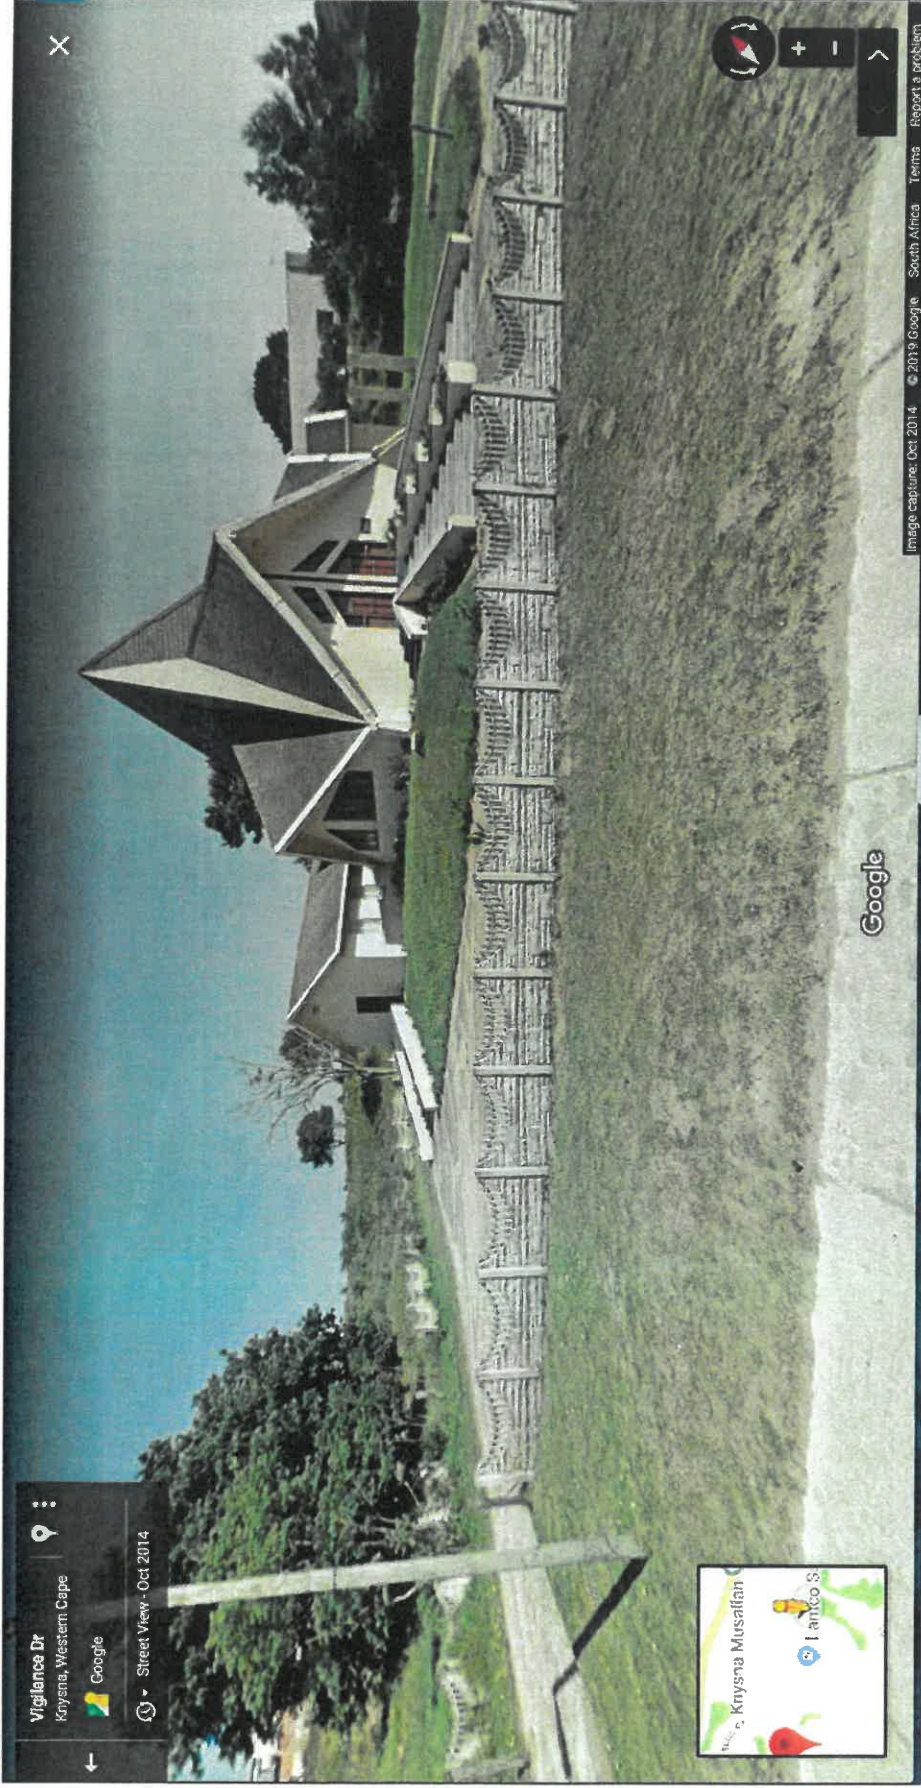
General Site Context. General view of the site, looking north-west towards the site from Vigilance Drive (Google Street View, Oct 2014)
